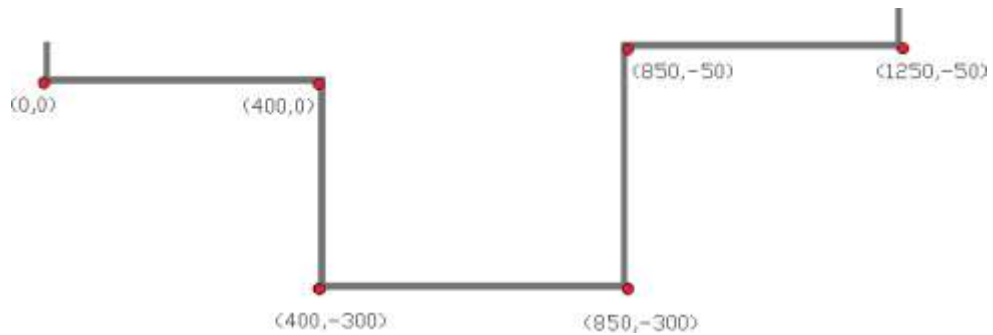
Corners coordinates of the proposed curtain wall façade
